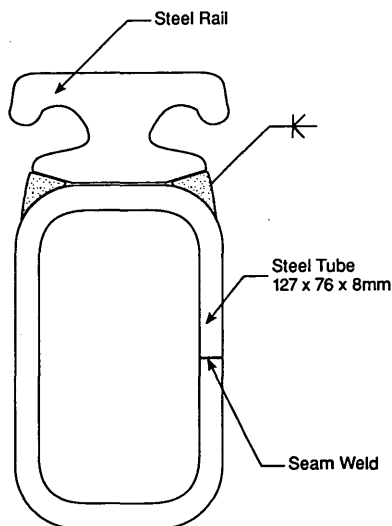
Tubular centerbeam with welded rail.
